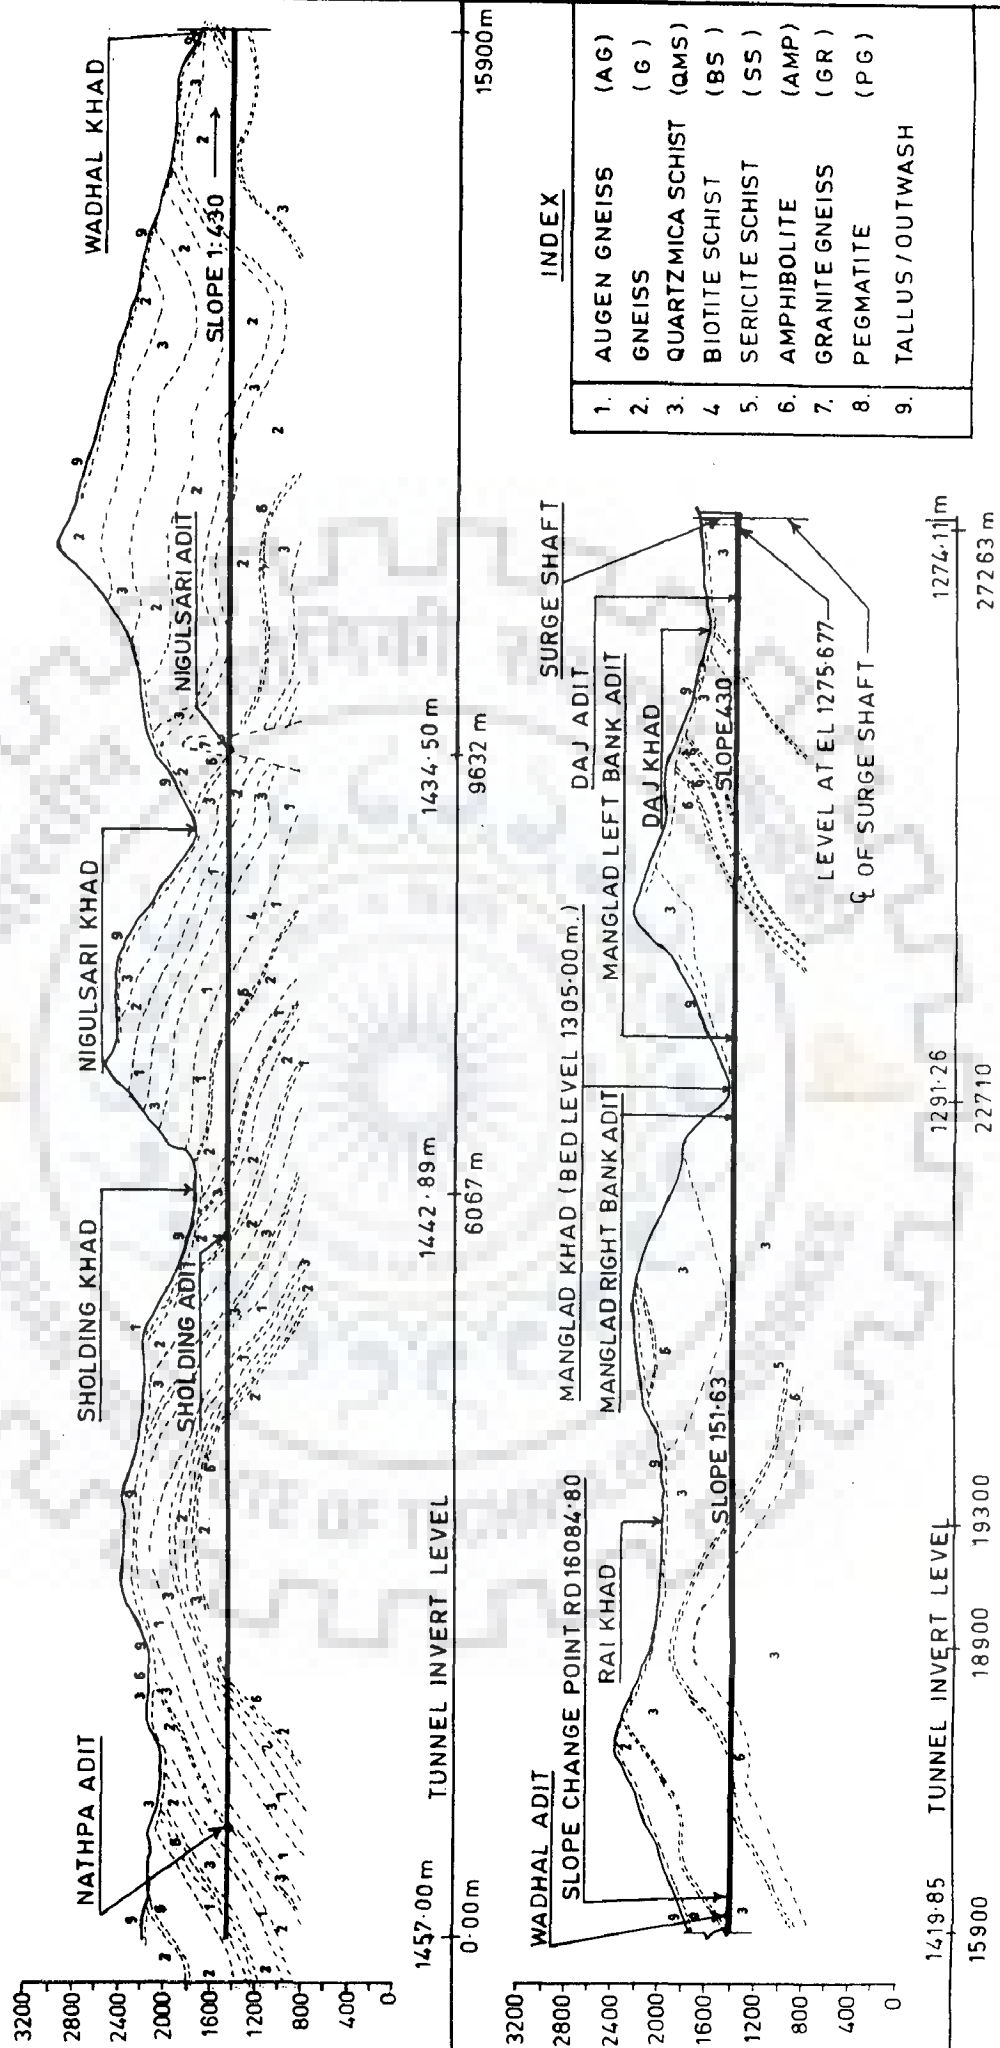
Geological section along tunnel alignment (GSI, 1988)
